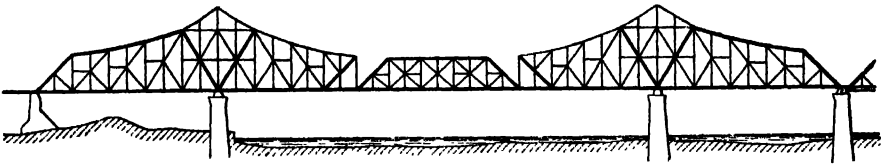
Layout of Cantilever Bridge with Idle Top Chord Members Omitted.
